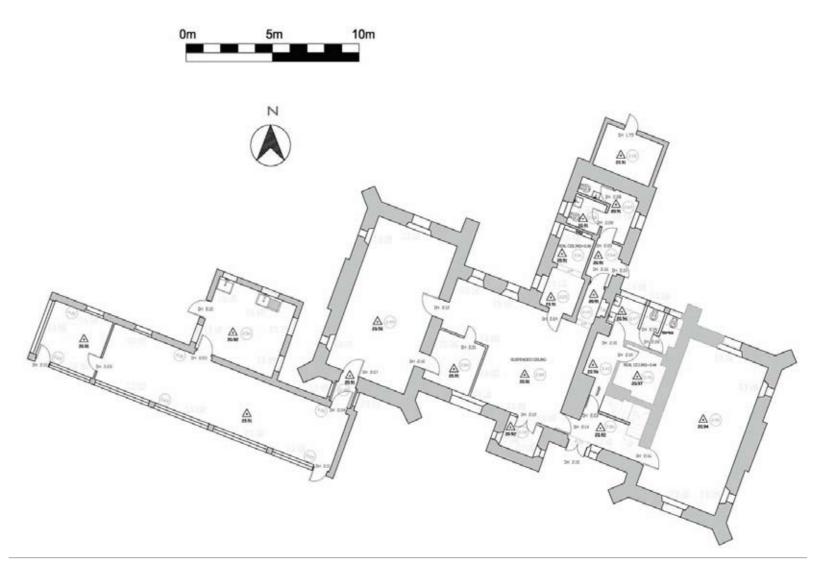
6: Ground floor plan of male infirmary as existing from survey
